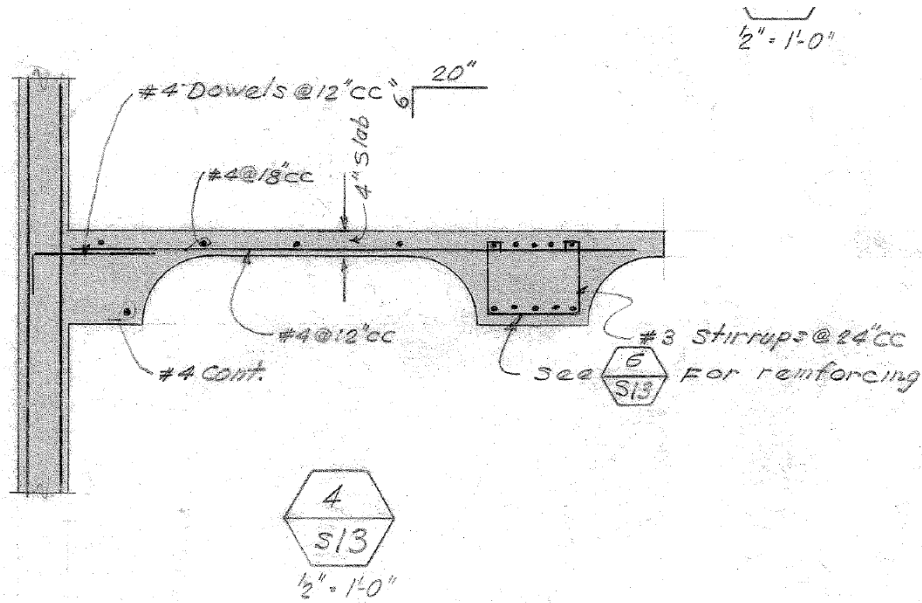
Shelter/Breezeway to Concrete Wall Connection Detail 4/S13
